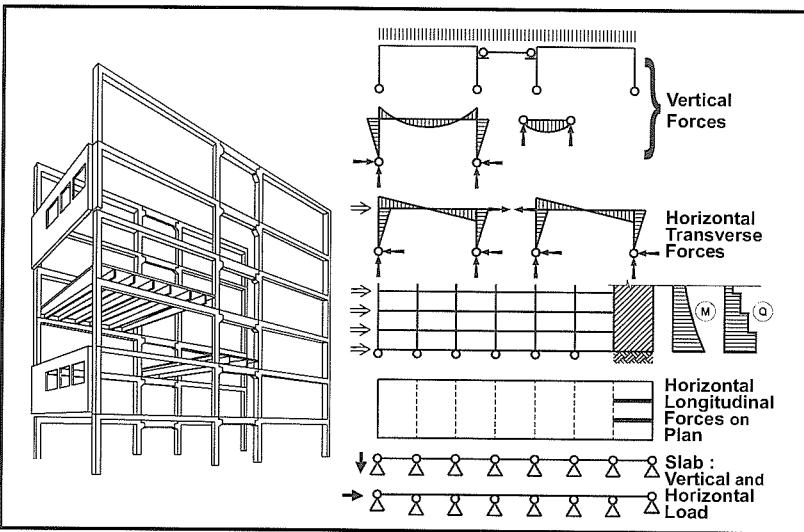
Statical Model Of Skeletal Frame For Horizontal And Vertical Forces
